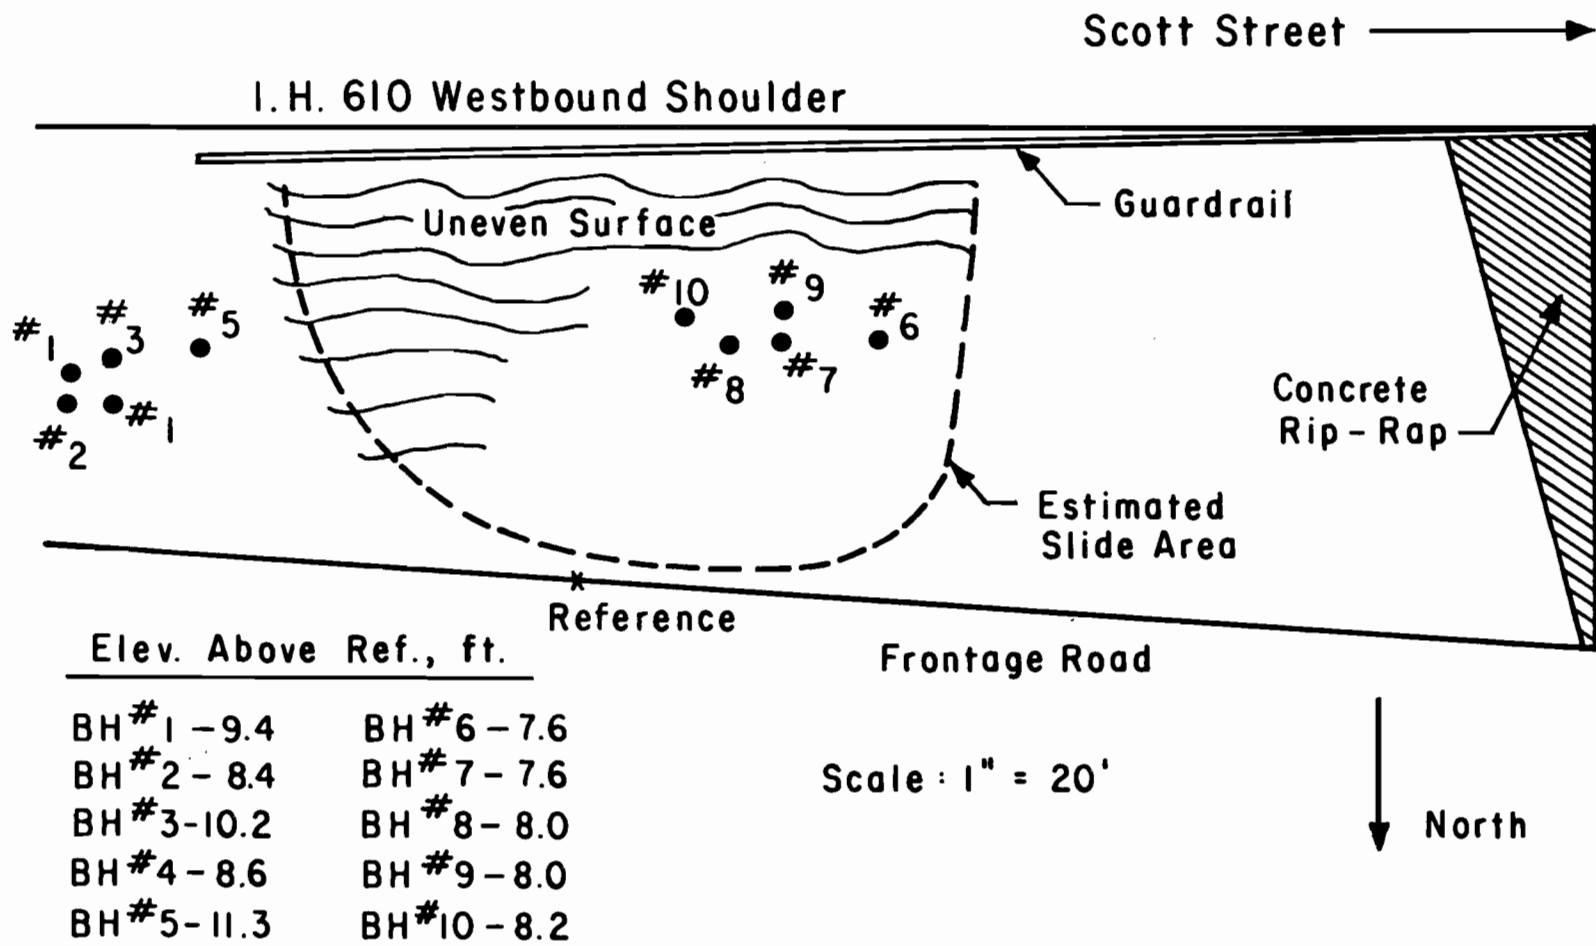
Plan View of Failed Embankment at Intersection of I. H. 610 and Scott Stress in Houston, Texas.
